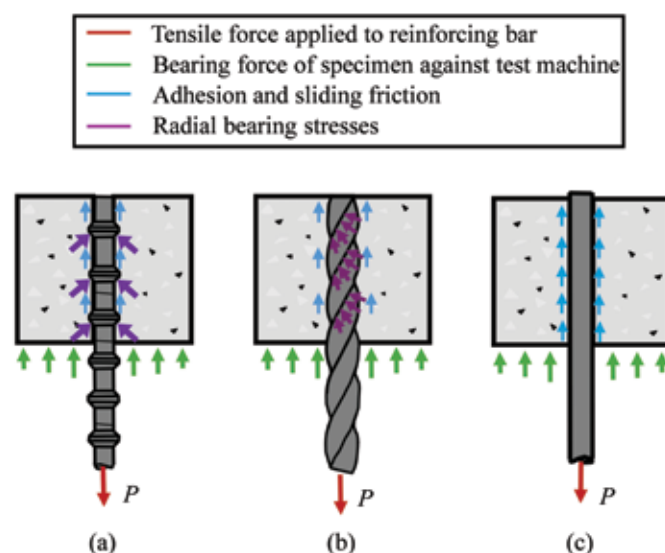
Bond forces along reinforcing bars: (a) deformed bar; (b) twisted square bar; and (c) plain bar
